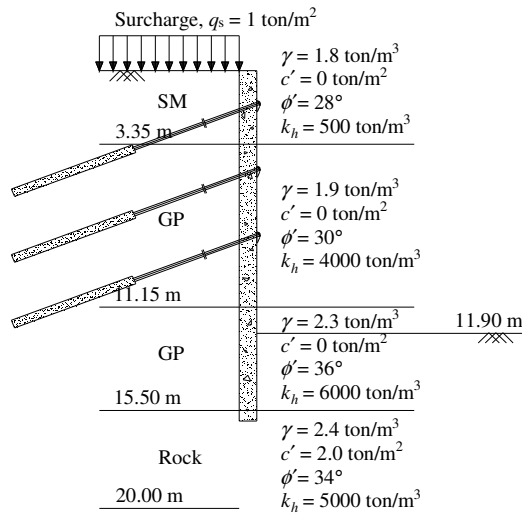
Excavation with a shoring system of soldier piles and anchor tiebacks
